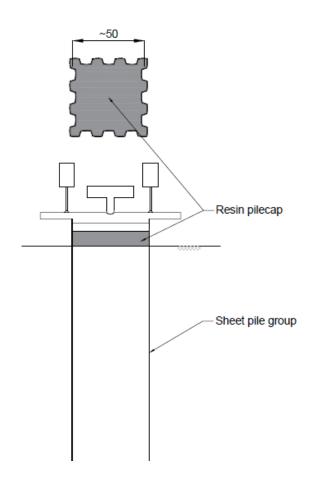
Square sheet pile with pilecap and loading cap arrangement
